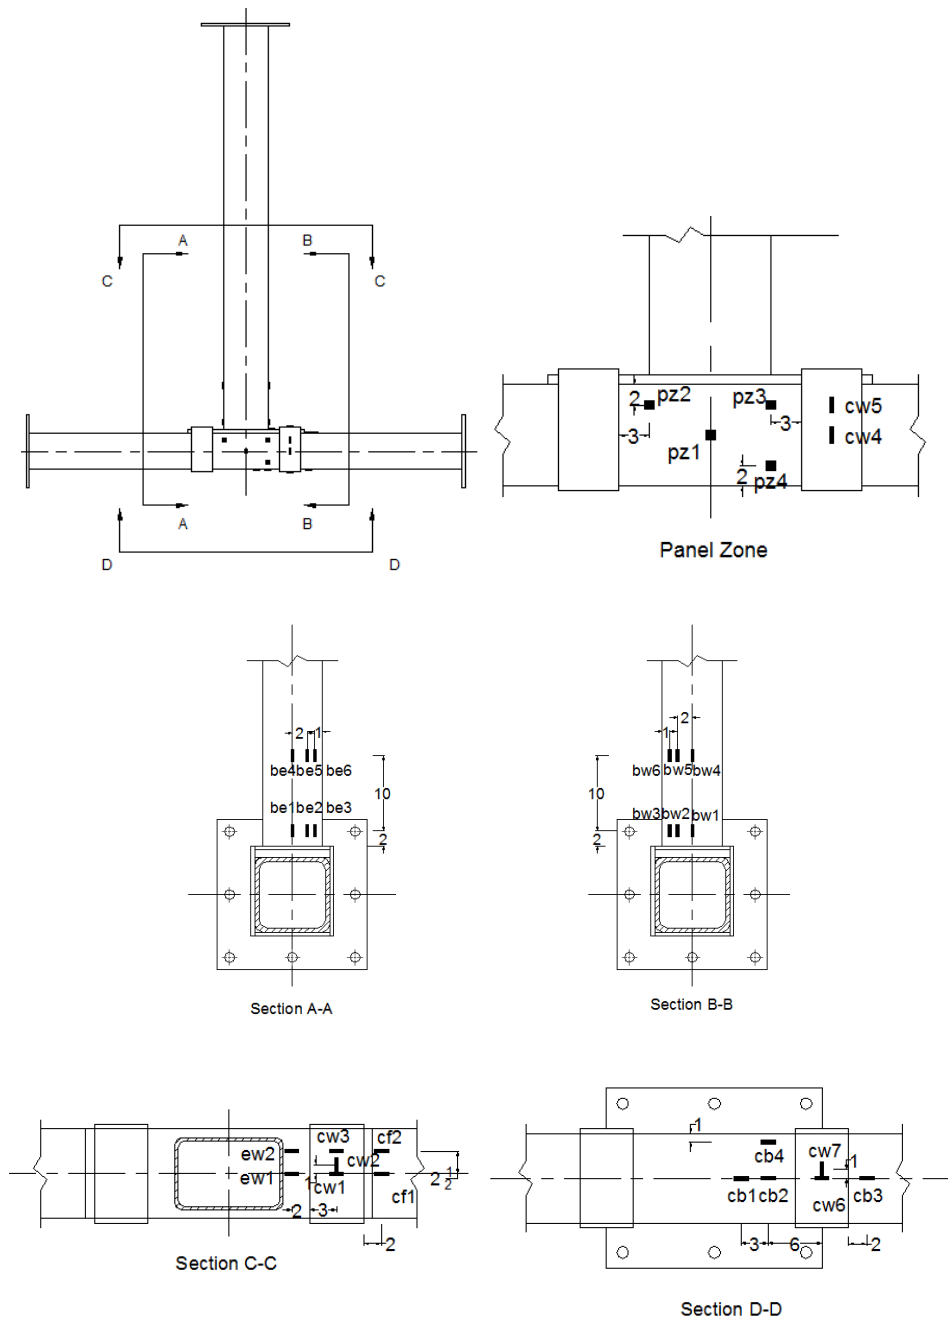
Strain Gage Locations for the Connection without Stiffeners (units in inch)
